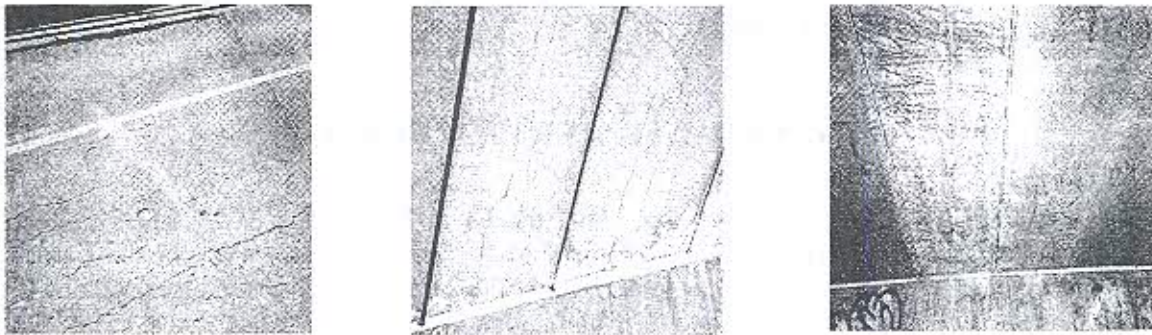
Cracking of the wearing course concrete (top) and beam plank (center) of MC bridge, and beam plank of BC bridge
